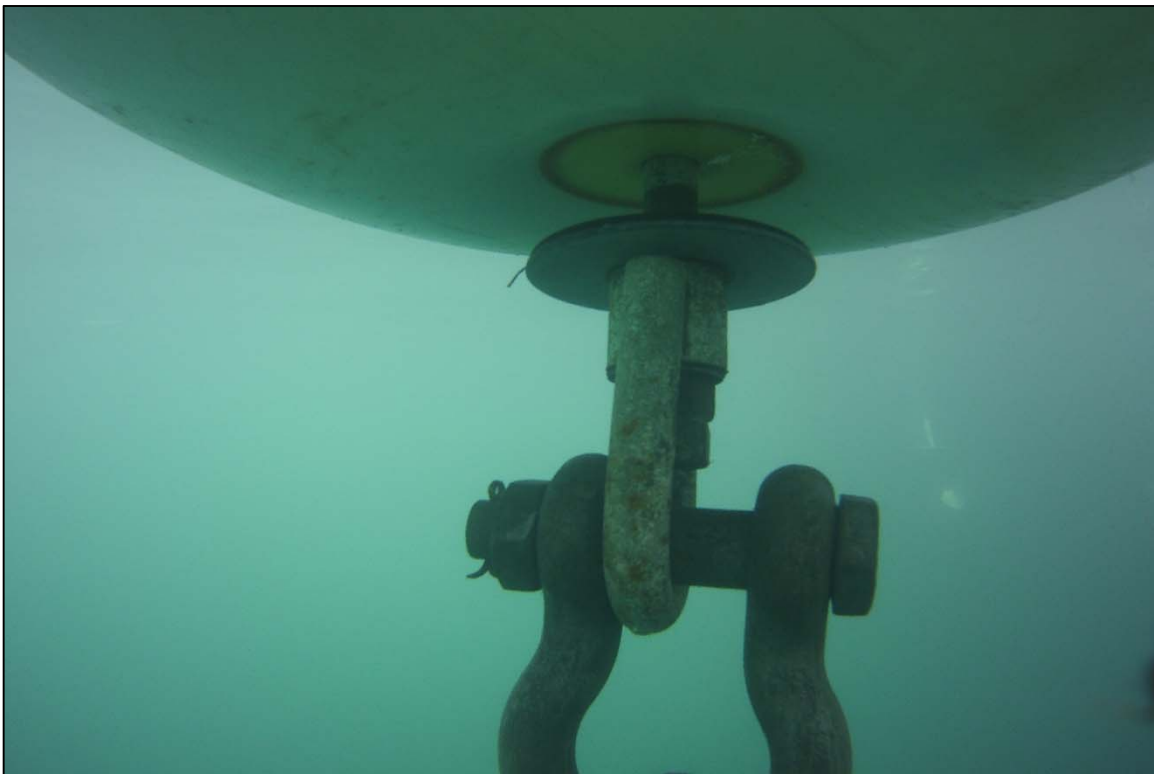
View of the Depressed Pen Support Float at the Southeast Corner, Looking Northeast.
